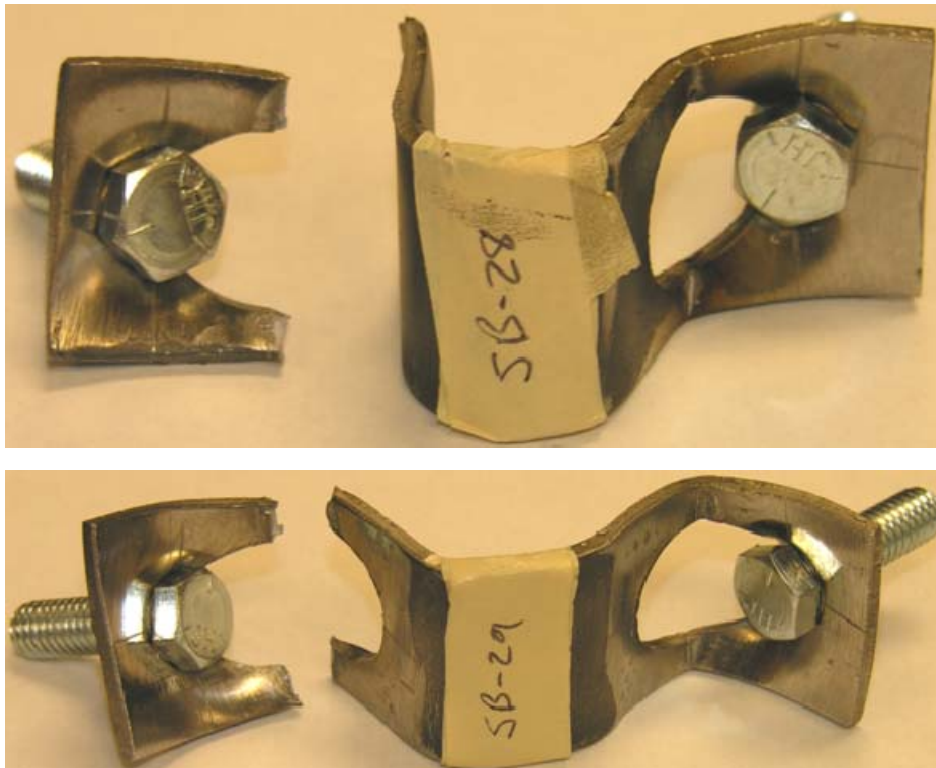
Bent Keyway Brackets – Test Nos. SB-28, SB-29: Lateral Loading
